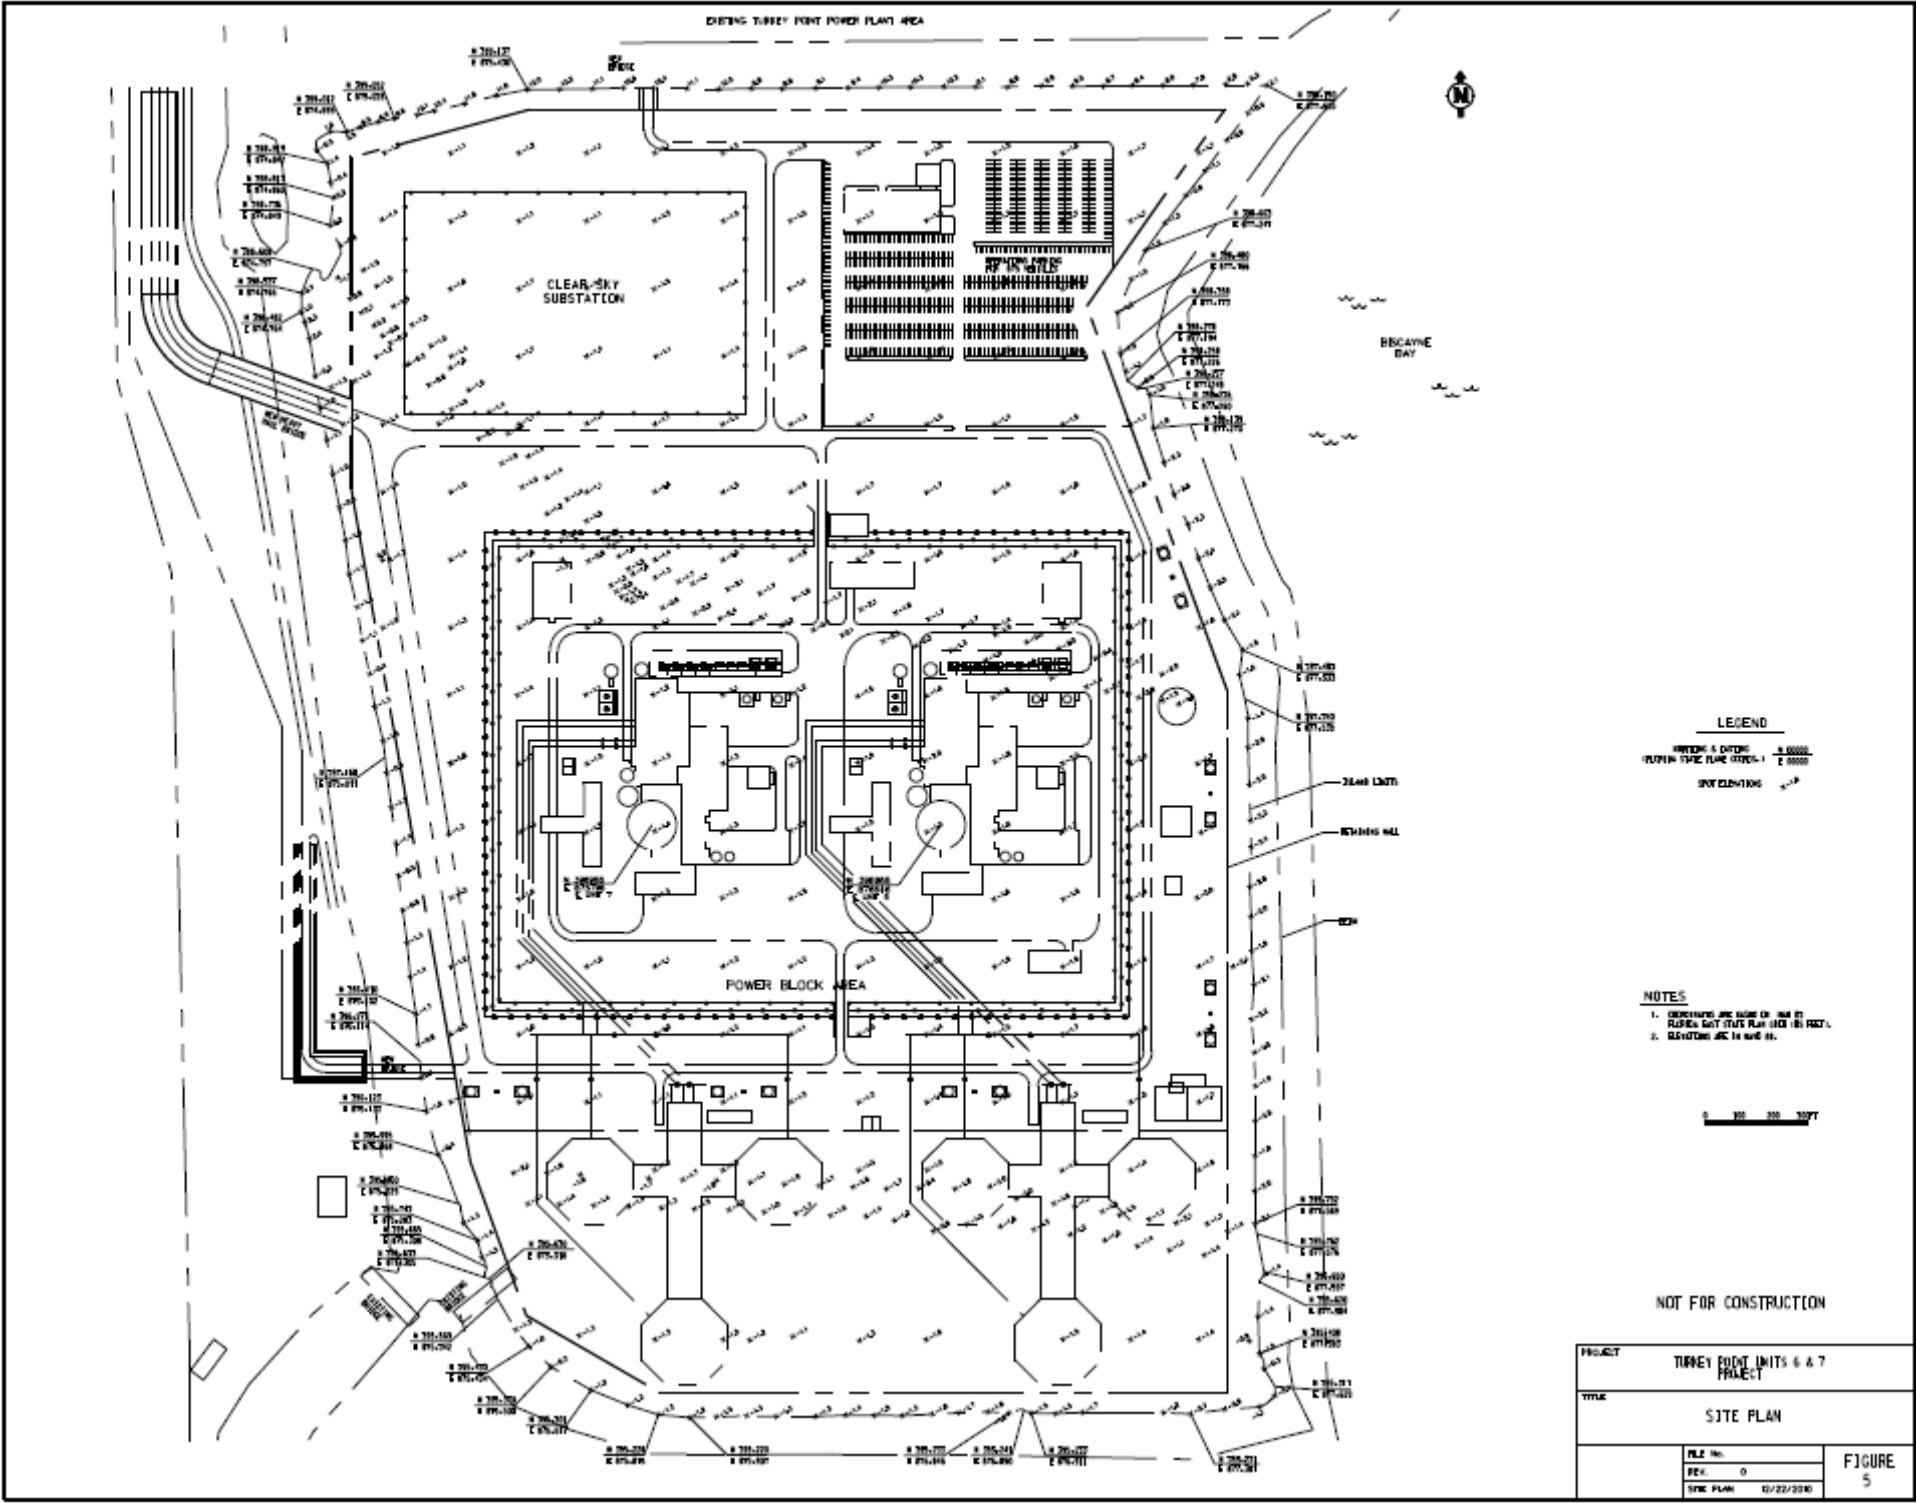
Turkey Point Unit 6 & 7 Site Plan
